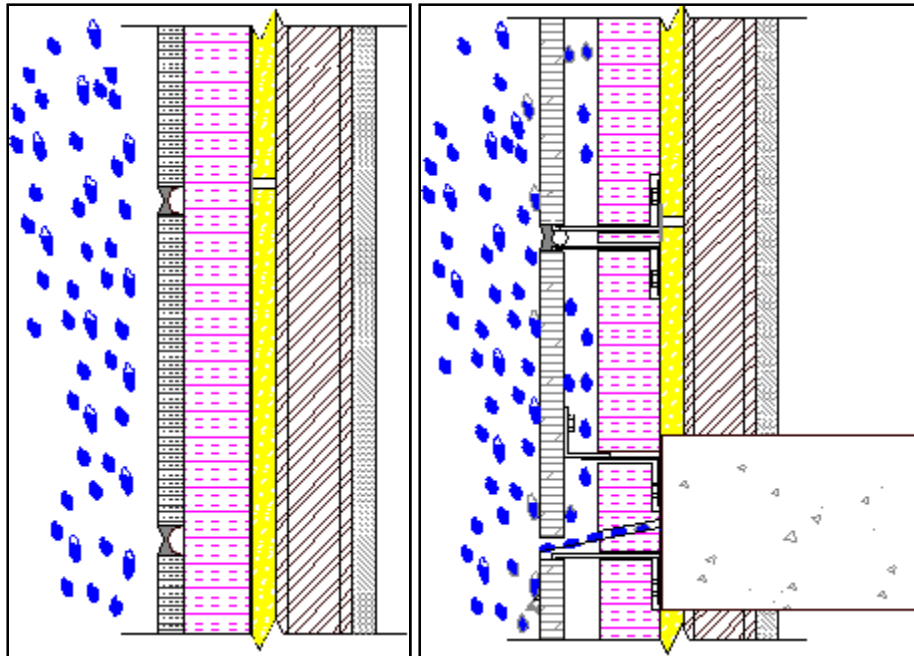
Left: Barrier Wall Diagram; Right: Cavity Wall Diagram
